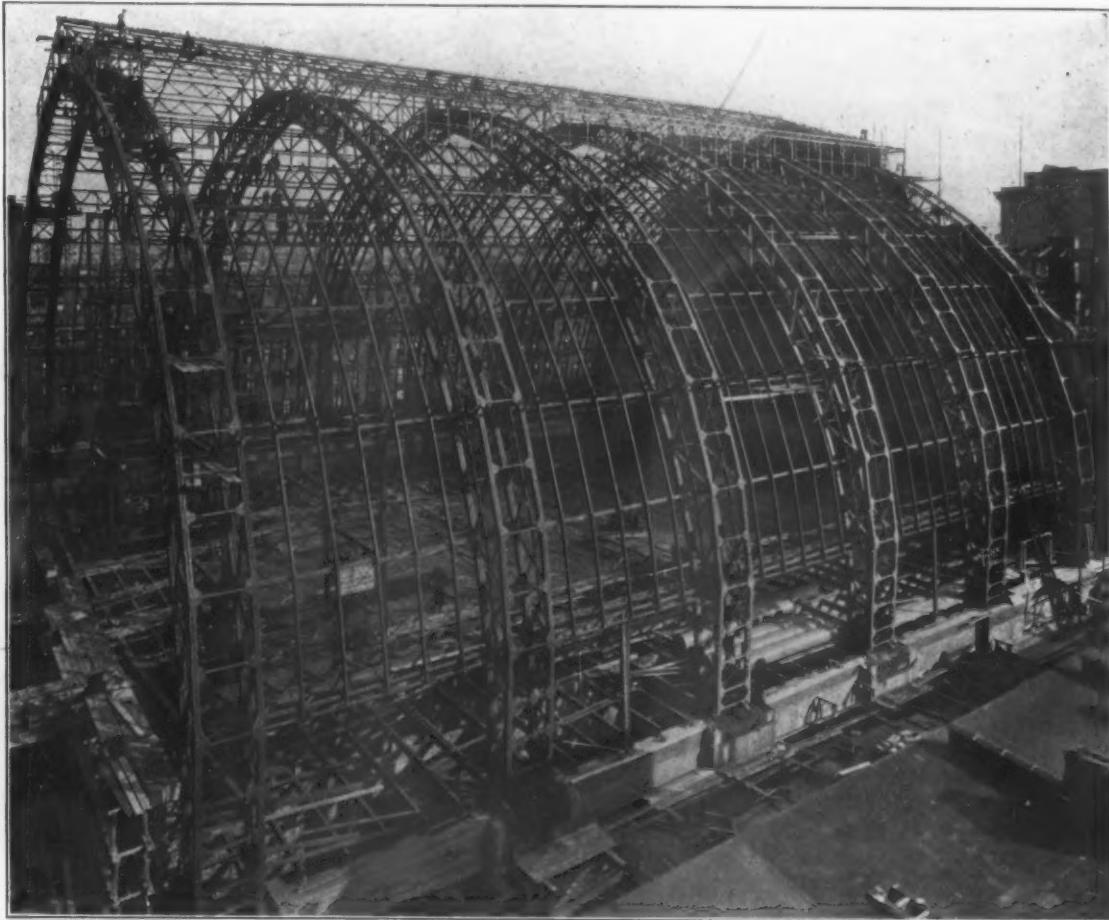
The Completed Steel Frame of the Sixty-ninth Regiment Armory Drill Hall.
